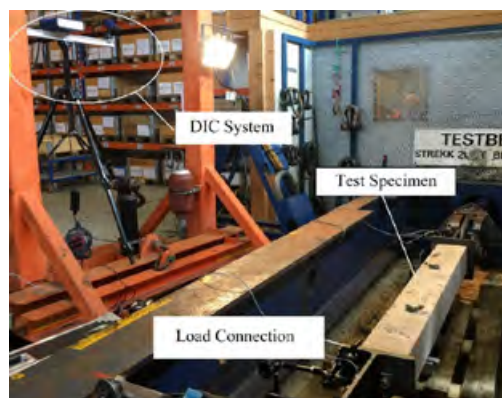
Tensile load application on the RC specimen mentioned in Naotunna et al. (2020).
